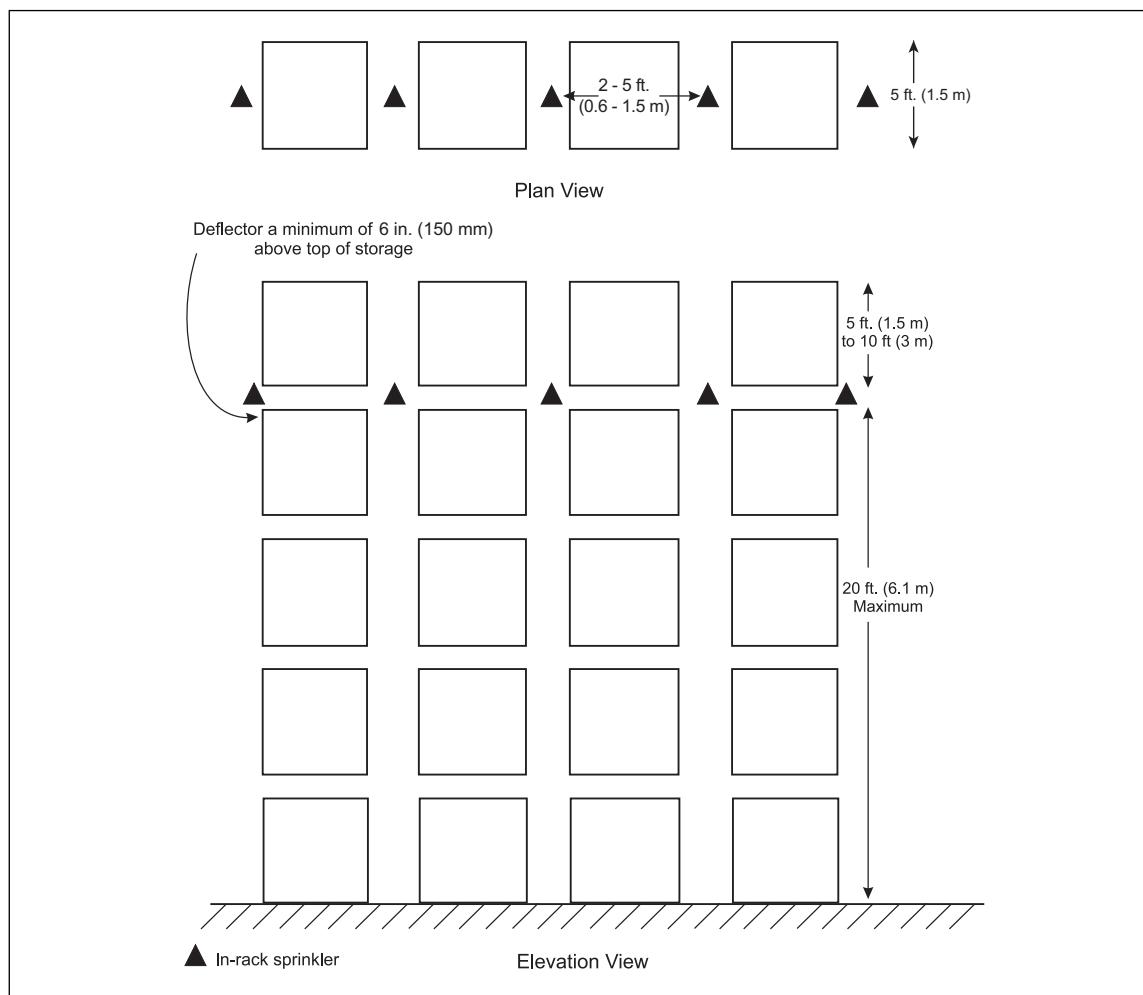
Single-row rack sprinkler layout: fire protection scheme E
